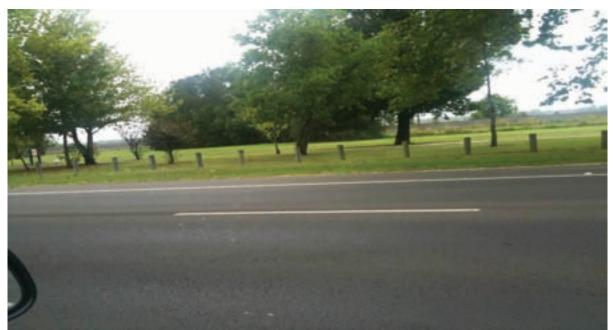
LOCATION M – Hawkesbury Valley Way (Windsor Street) facing south showing existing Railway line (which will need to be diverted to accommodate the proposed Runway) – this is the approx. location where the proposed 4000m Runway crosses this road
